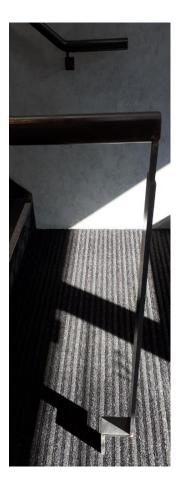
Ground Floor Metal Pole Under Stairs Photo 3 – Entrance Foyer Black Fire Control Box
